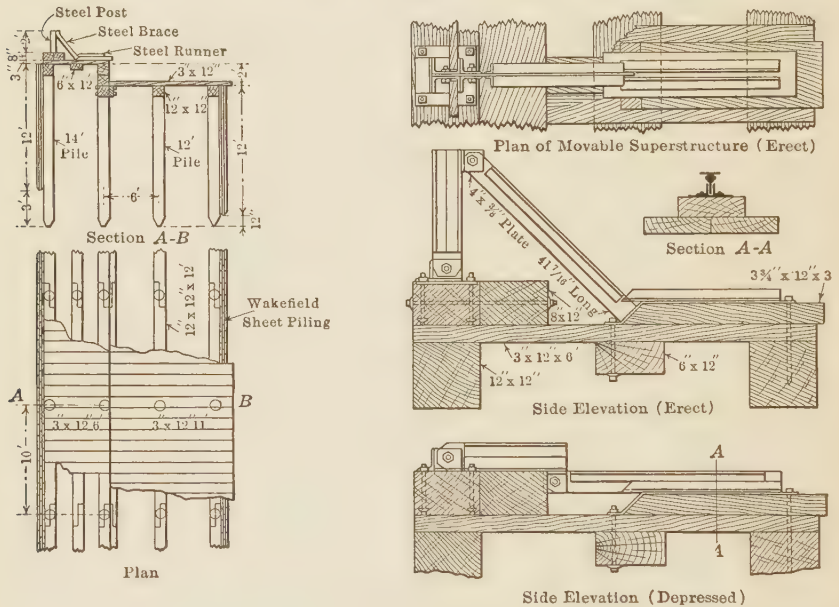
Details of movable superstructure collapsible diversion weir Prewitt Reservoir Project, Colo.
